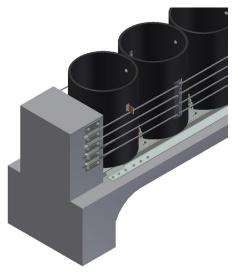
Restraining Cable Adjustment (Concrete Backup)
